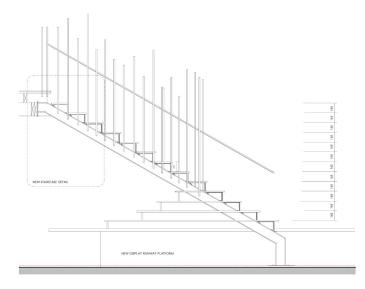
Elevation of new staircase-not to scale (Author 2013)
